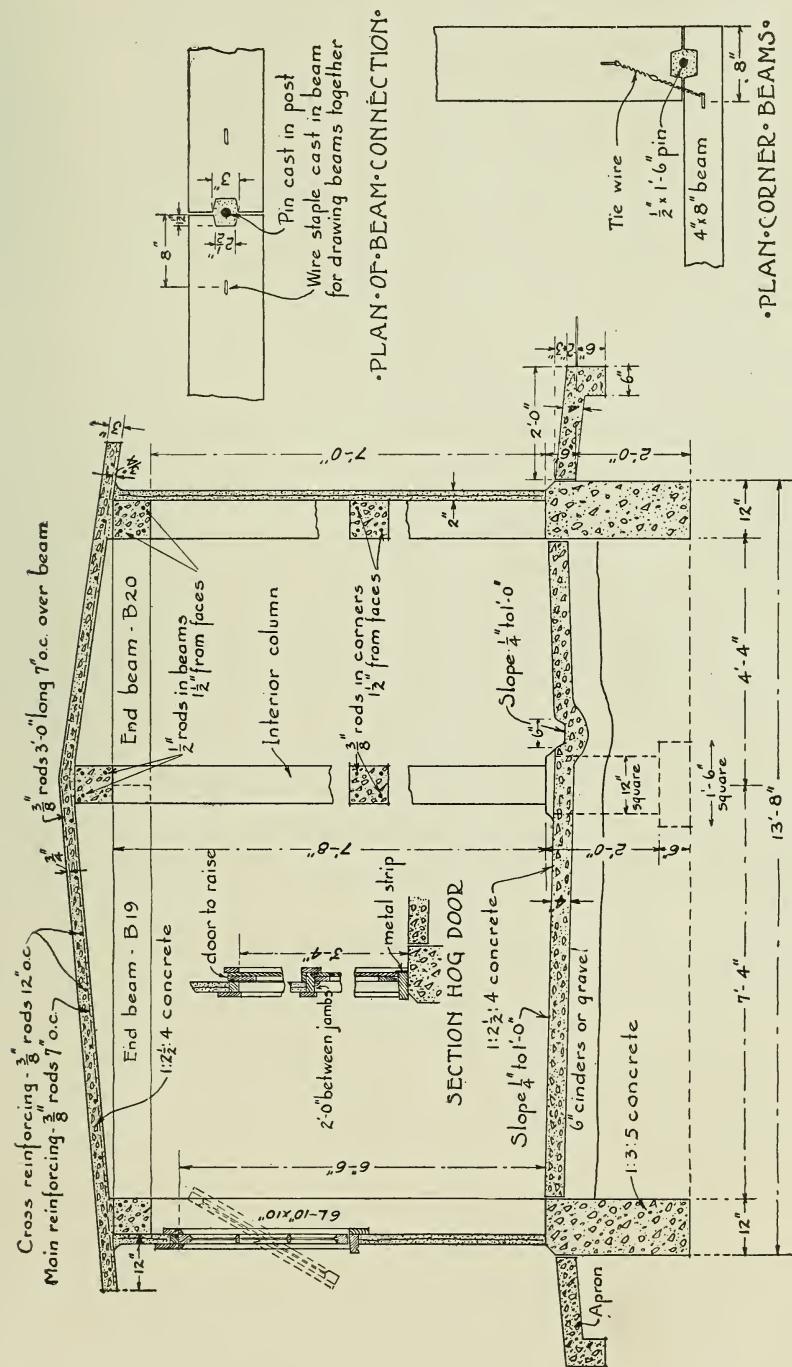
Detailed Sectional Views of Cement Plaster Hog House. The arrangement of columns and beams is clearly shown in this illustration.
